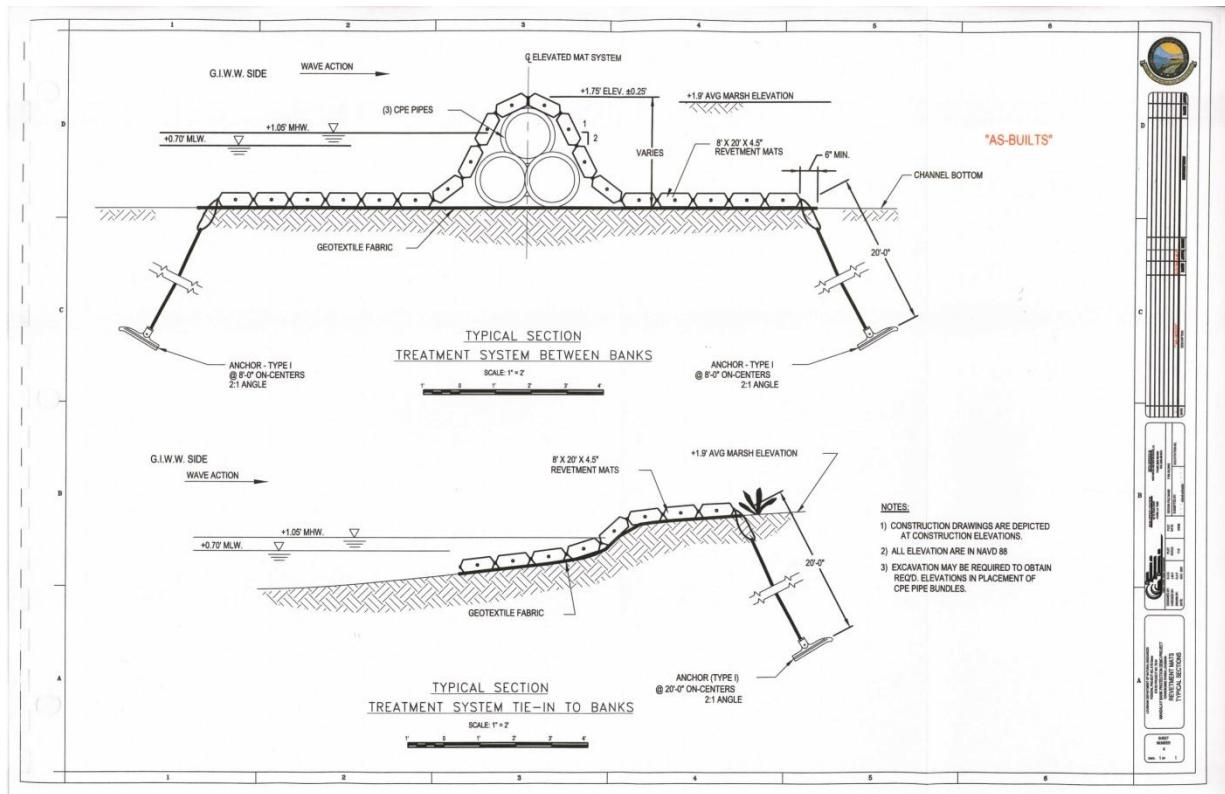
Typical cross sections showing the Mandalay Bank Protection Demonstration (TE-41) project's submerged articulated concrete revetment mat (R) structures.
